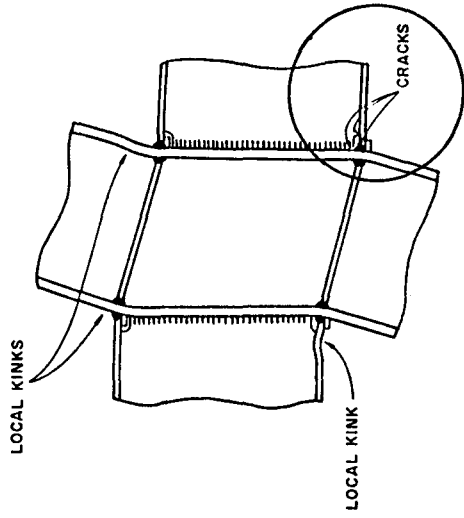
Cracks in Beam Weld due to Distortion of Panel Zone
